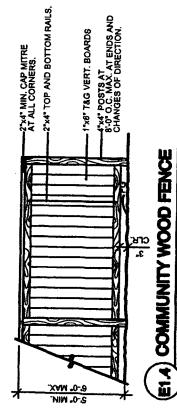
CONCEPTUAL WALL AND FENCE ELEVATIONS
